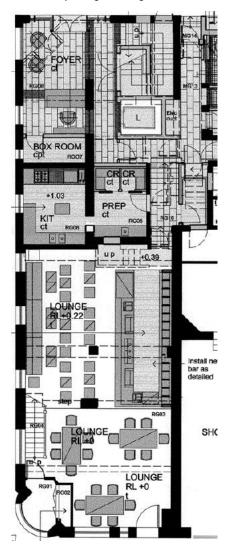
143–143a George Street, The Russell Hotel, ground floor plan, development application 2009. Source: PMNSW Drawing ROX-410-DA-0027-CP.
